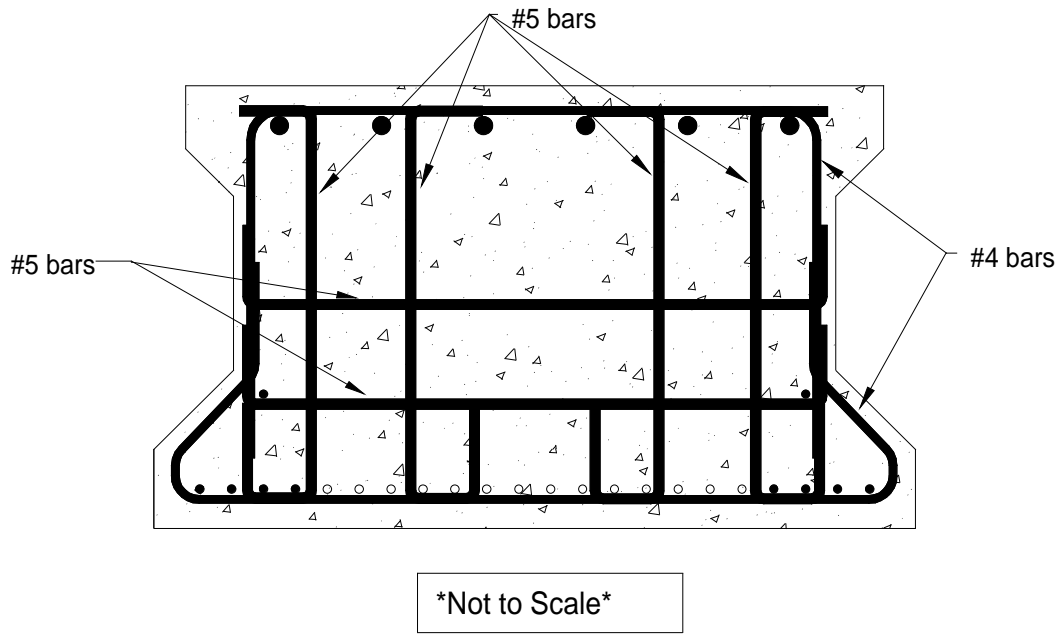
Diagonal Reinforcement at 1½ inches from End Face
